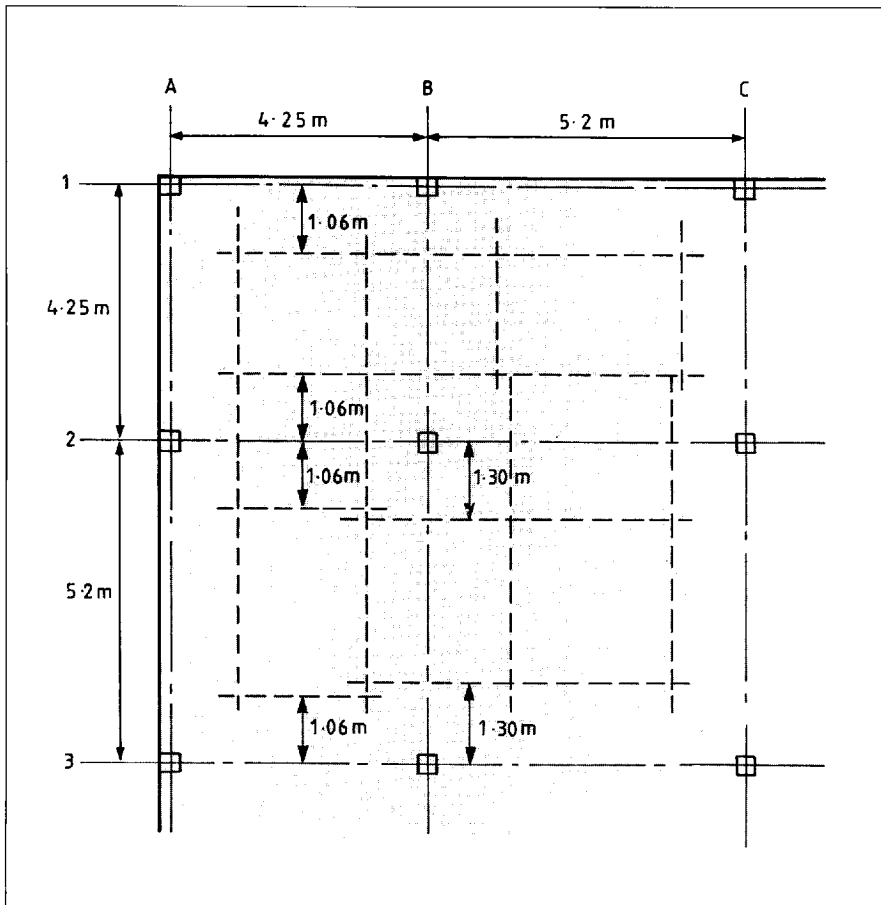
Assumed strip widths (arrangement symmetrical about diagonal A/1-C/3)
